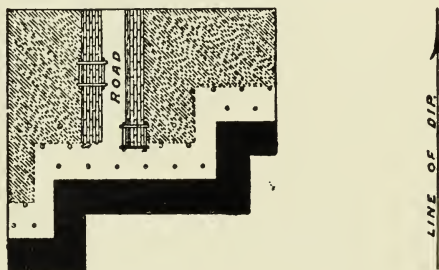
COWDENBEATH COLLIERIES, EAST SCOTLAND. PLAN SHOWING FACE OF LONGWALL WORKING IN THE DUNFERMLINE SPLINT COAL SEAM.
